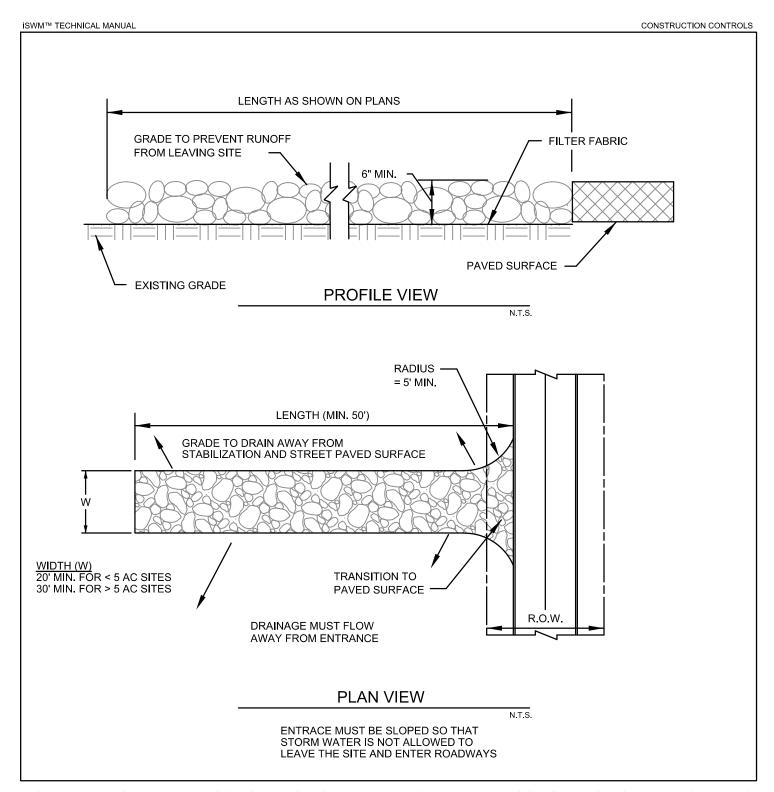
STANDARD CONSTRUCTION DETAIL - STABILIZED CONSTRUCTION EXIT (1 OF 2)
